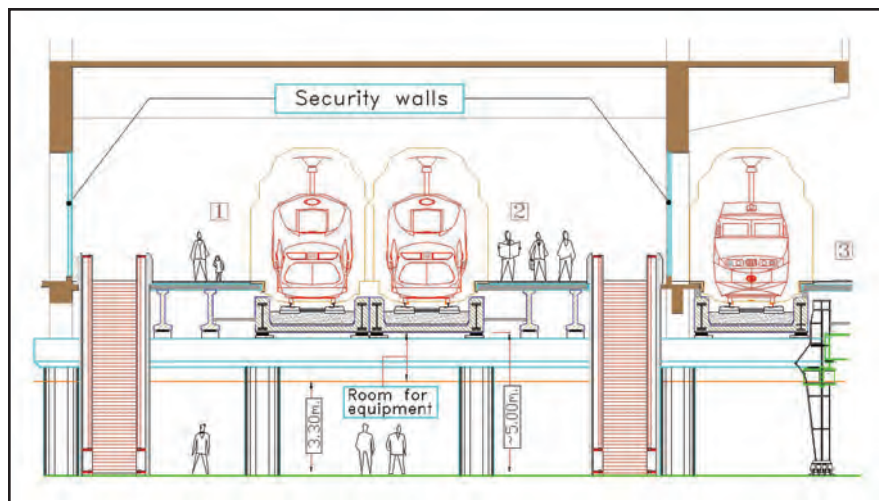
Cross section of station for Eurostar trains to London showing precast, prestressed U-shaped deck supporting railway tracks and platforms. (Courtesy of Tucrail)
